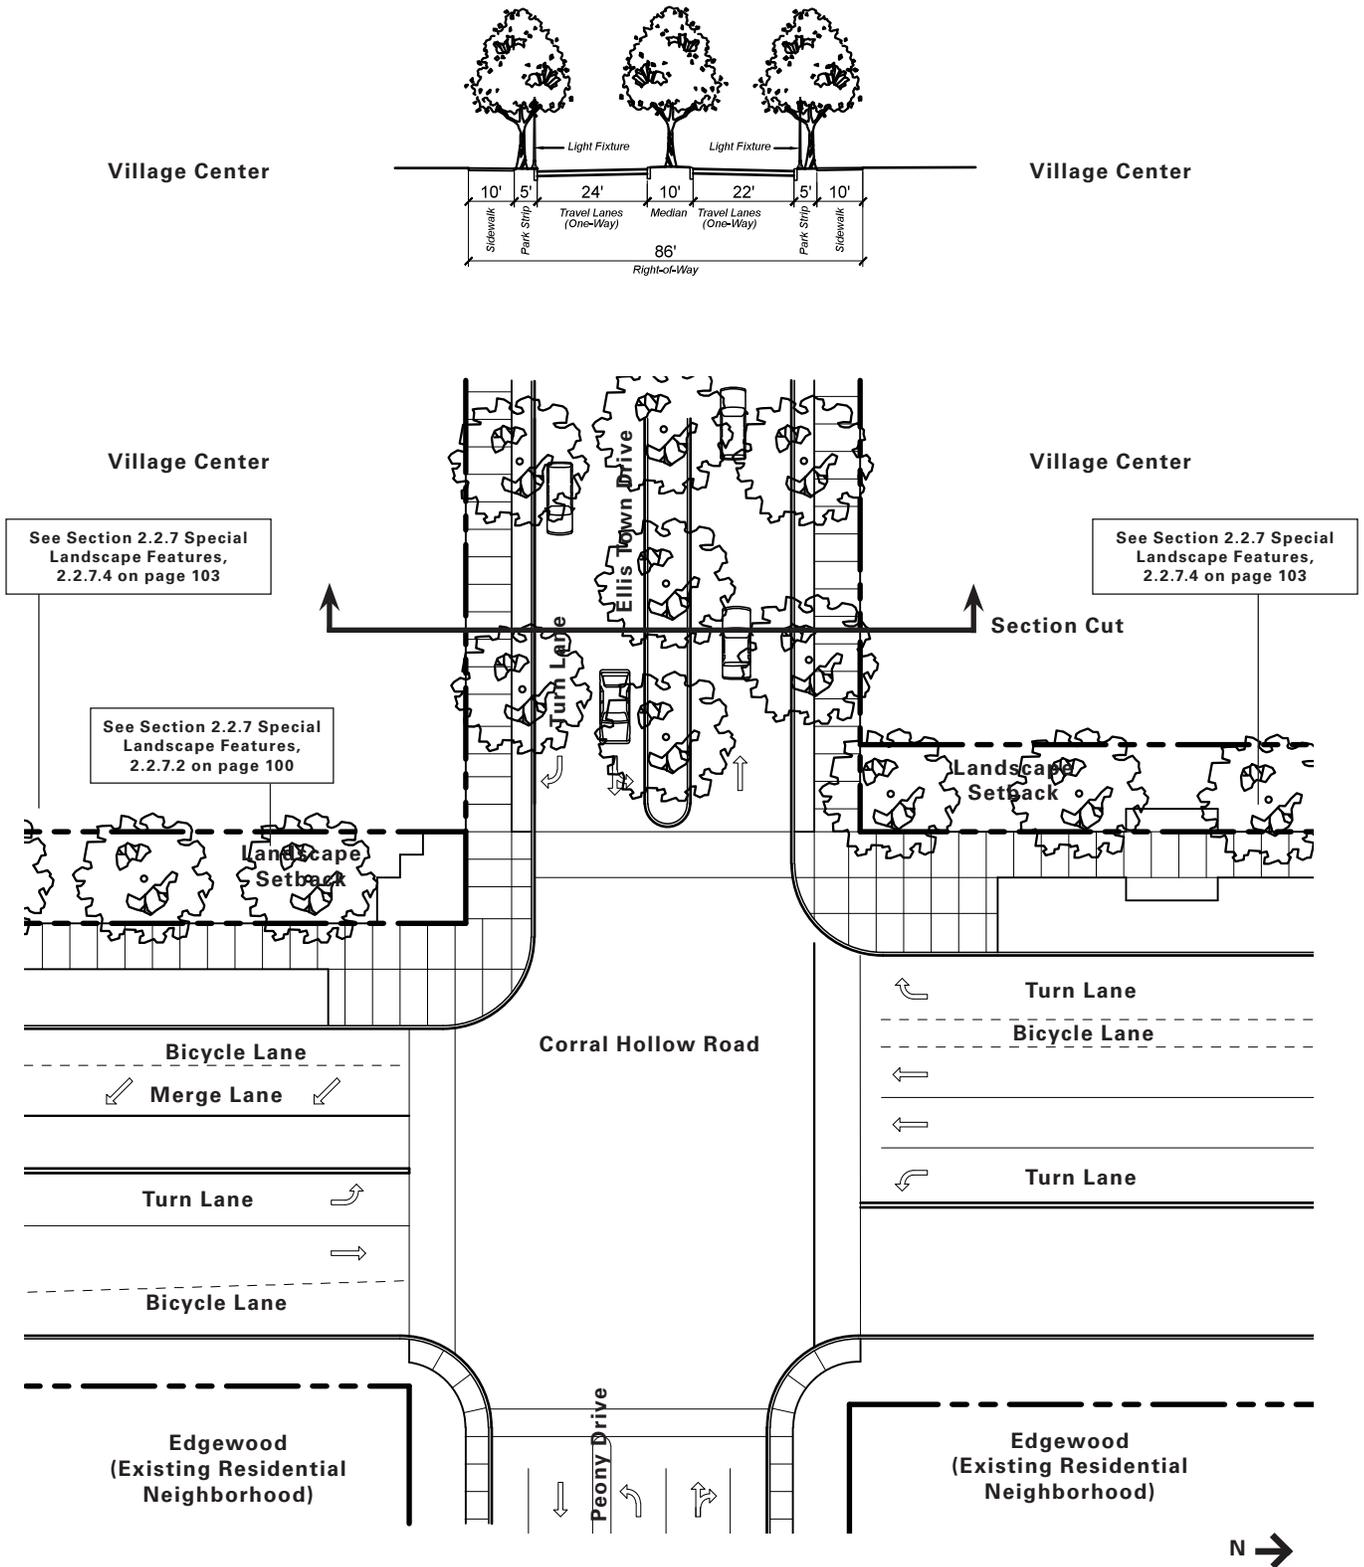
Proposed Section and Plan: Entry Street C (Ellis Town Drive)
